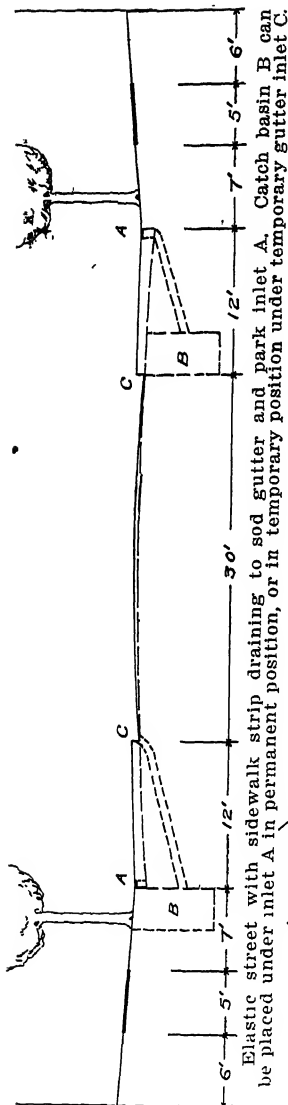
PHILADELPHIA'S STANDARD ELASTIC STREET. TEMPORARY SECTION FOR 80-FT. STREET.
